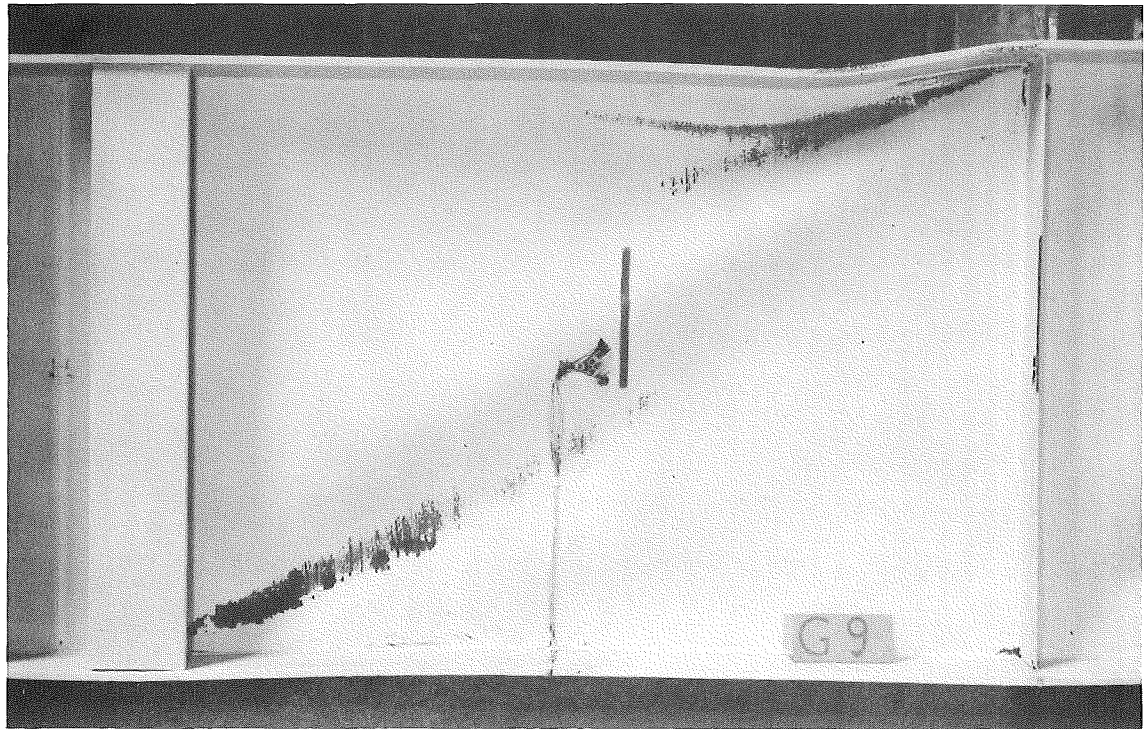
Failure of Girder G9 in Test T3
